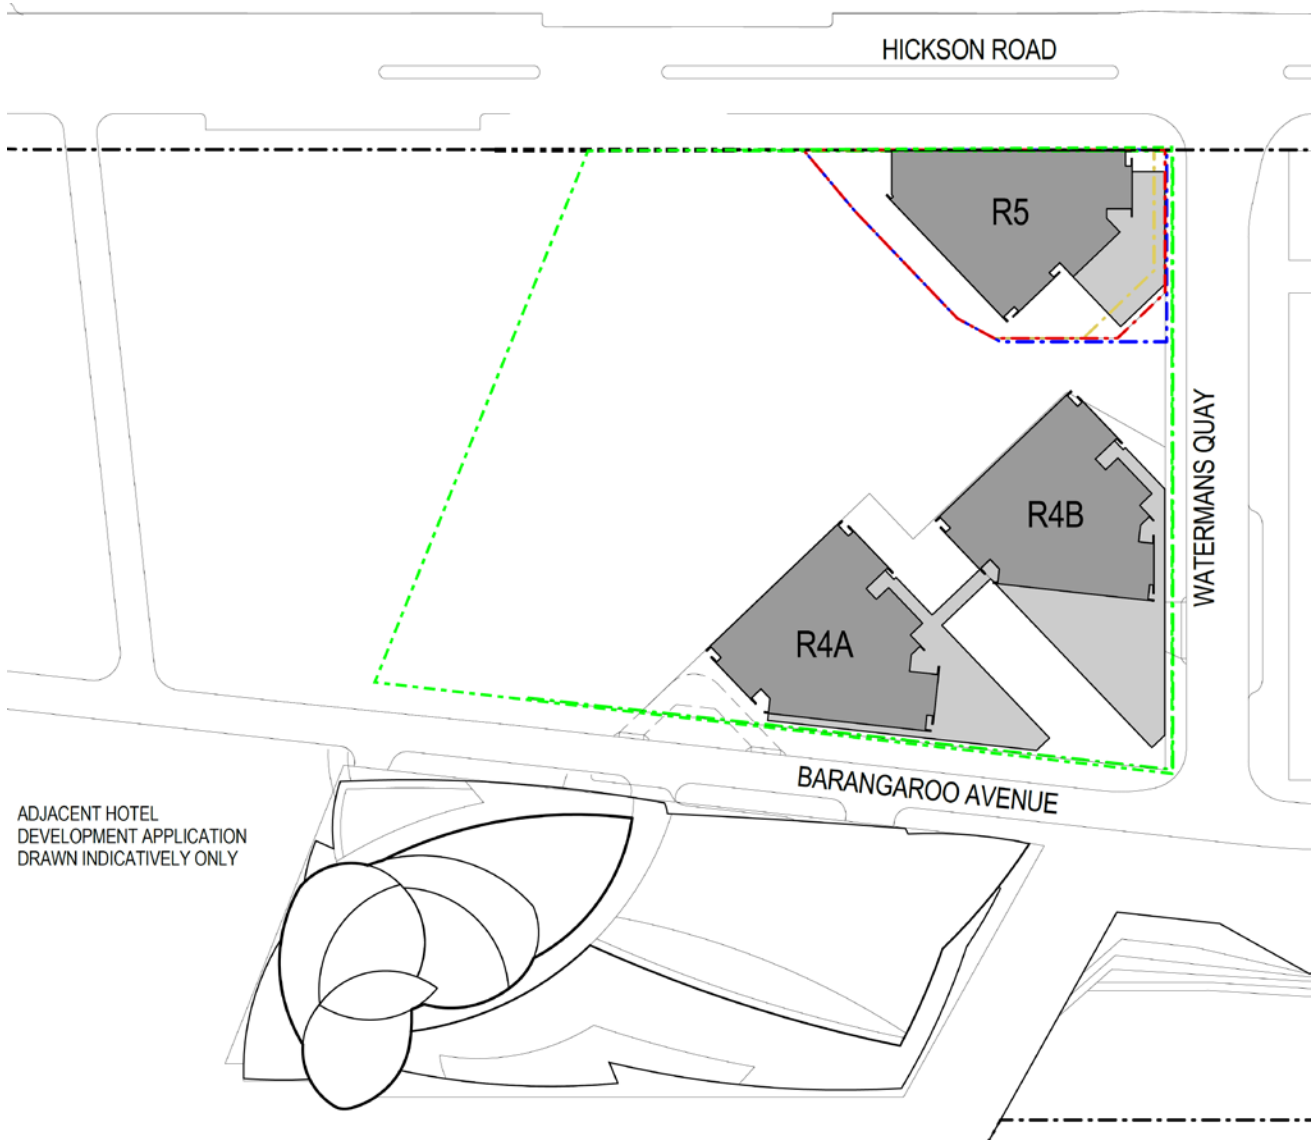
R5 Residential Building Development Application Site Location Plan
